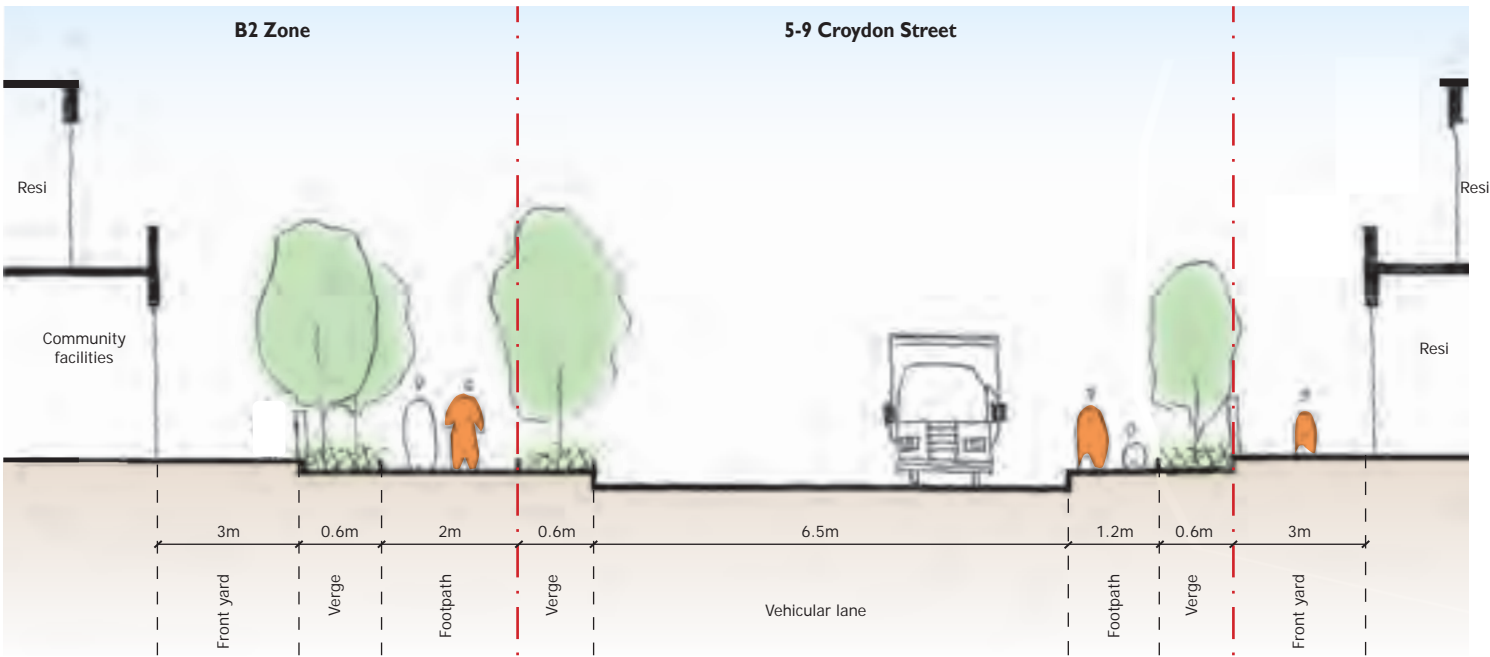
Typical street section through the proposed service lane at No. 5-9 Croydon Street
